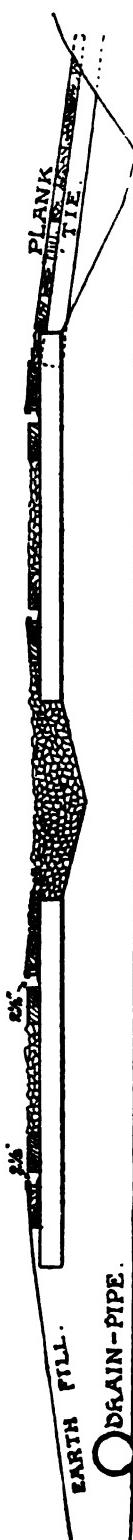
ROAD-CROSSING—BALLAST FILLING BETWEEN GUARD PLANKS.
